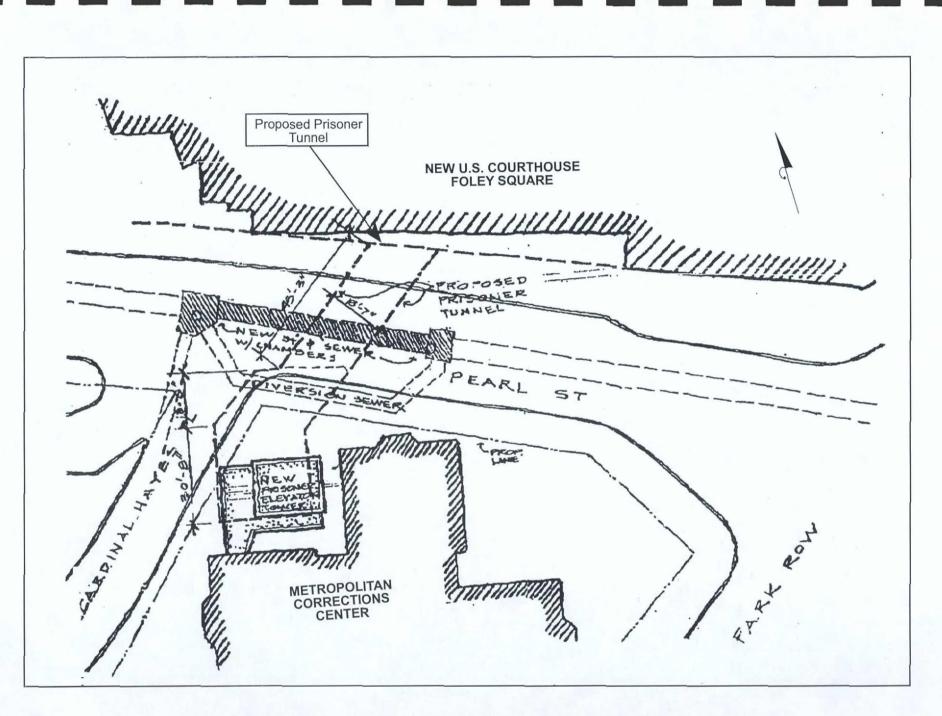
Schematic showing proposed prisoner tunnel between the Metropolitan Corrections Center and the new U.S. Courthouse. Site plan provided by the General Services Administration.
